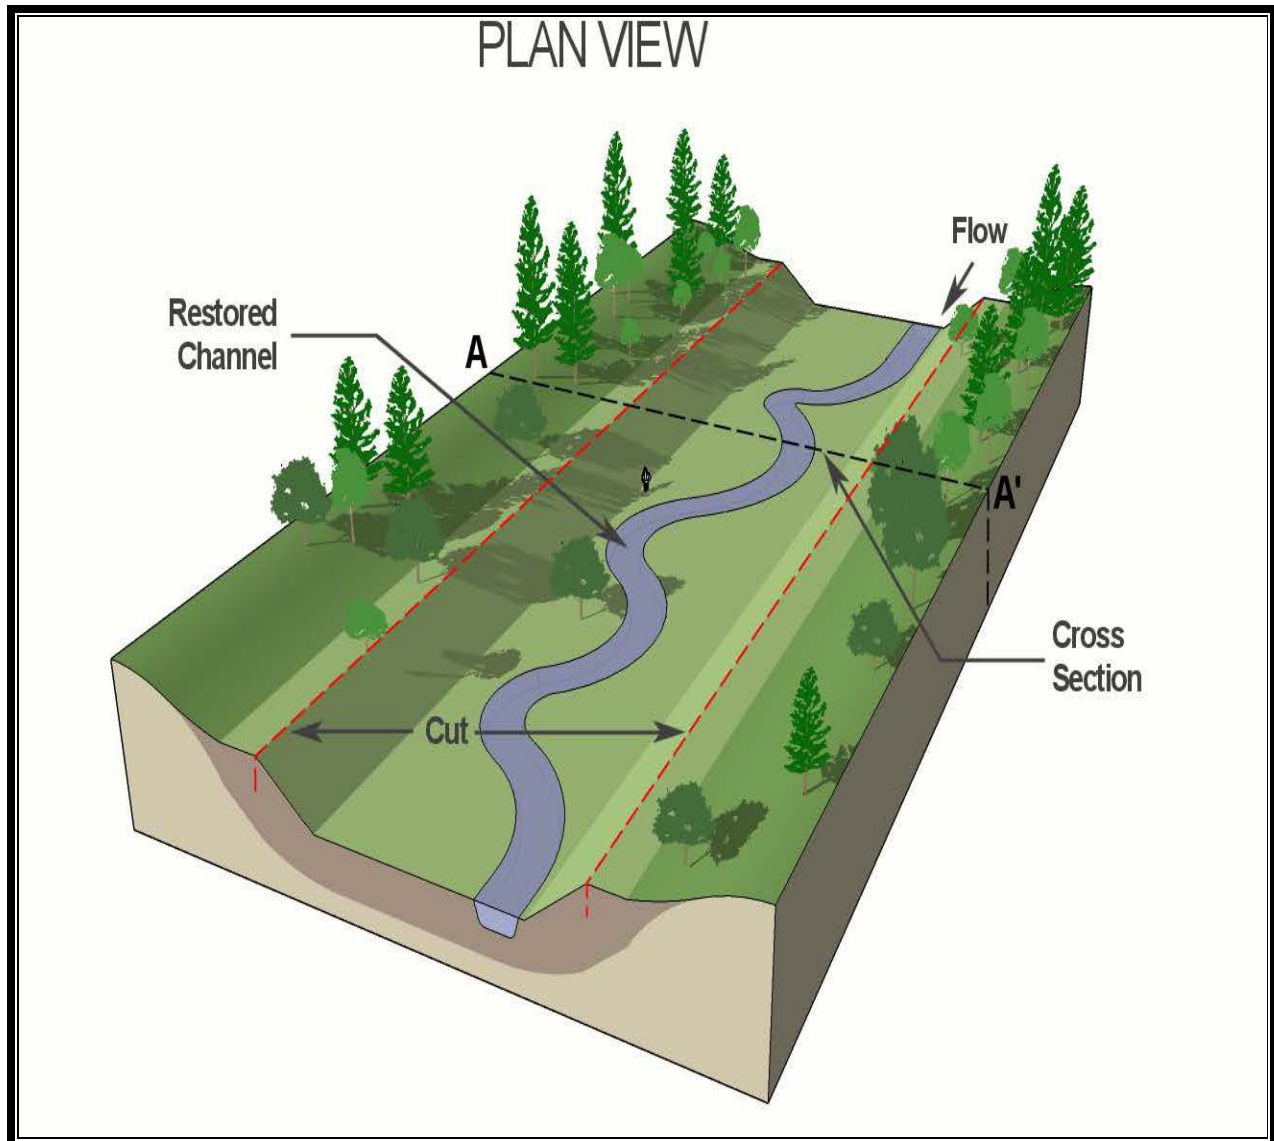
P3-FLOODPLAIN BENCH APPROACH-PLAN VIEW
